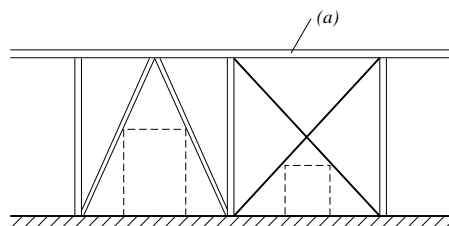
Wall bracing. (STEP 1995 Article D9)
